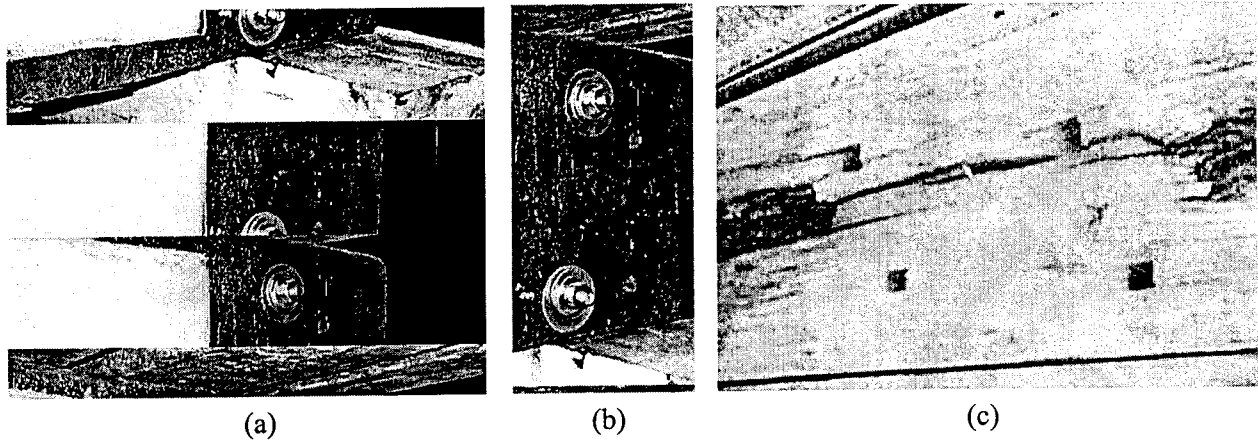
(a) Composite Shear Plate Concept on Span Timber, (b) Surface Treatment Reduces Bonding Effectiveness, (c) Severe Cracking may Benefit from Epoxy Filling.
